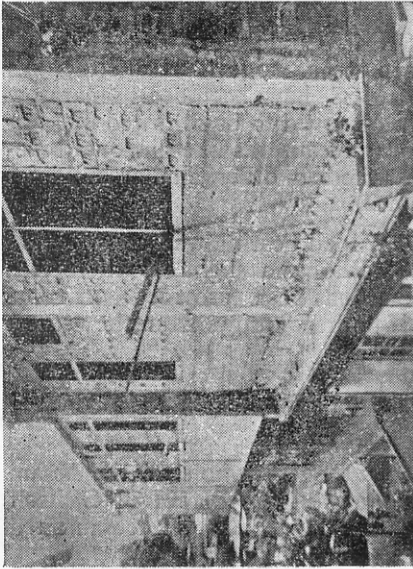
Half Brick reinforced external walls without sufficient bands in the wall panels. Internal partition walls are without reinforcement at any course.
